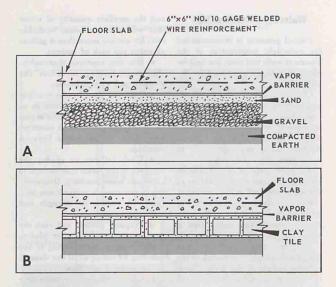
Waterproof construction of basement floor in compact or clay-like soll (A) and in very poorly drained soil (B).
